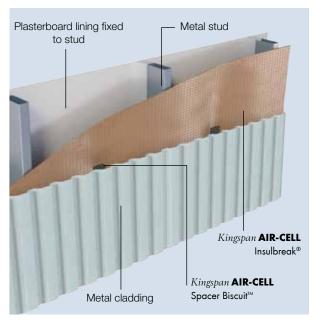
Kingspan AIR-CELL Insulbreak® on steel-framed wall
